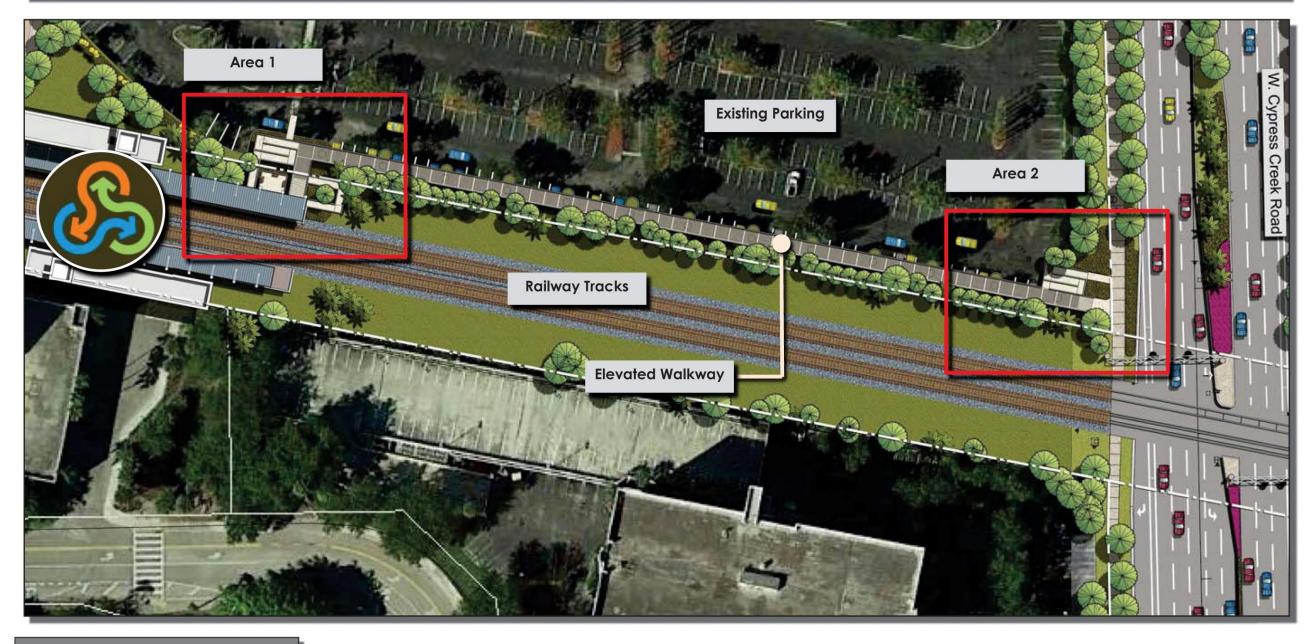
Elevated Walkway from Cypress Creek Tri-Rail Station (Southern Section)
